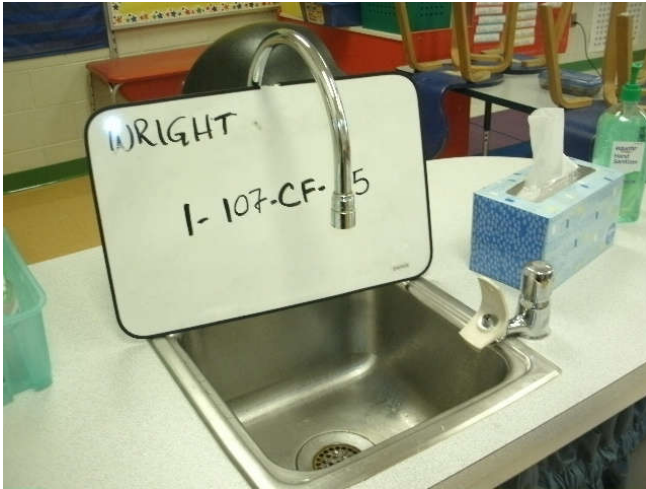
Classroom faucet w/bubbler, located on the 1st floor, in room 107.
